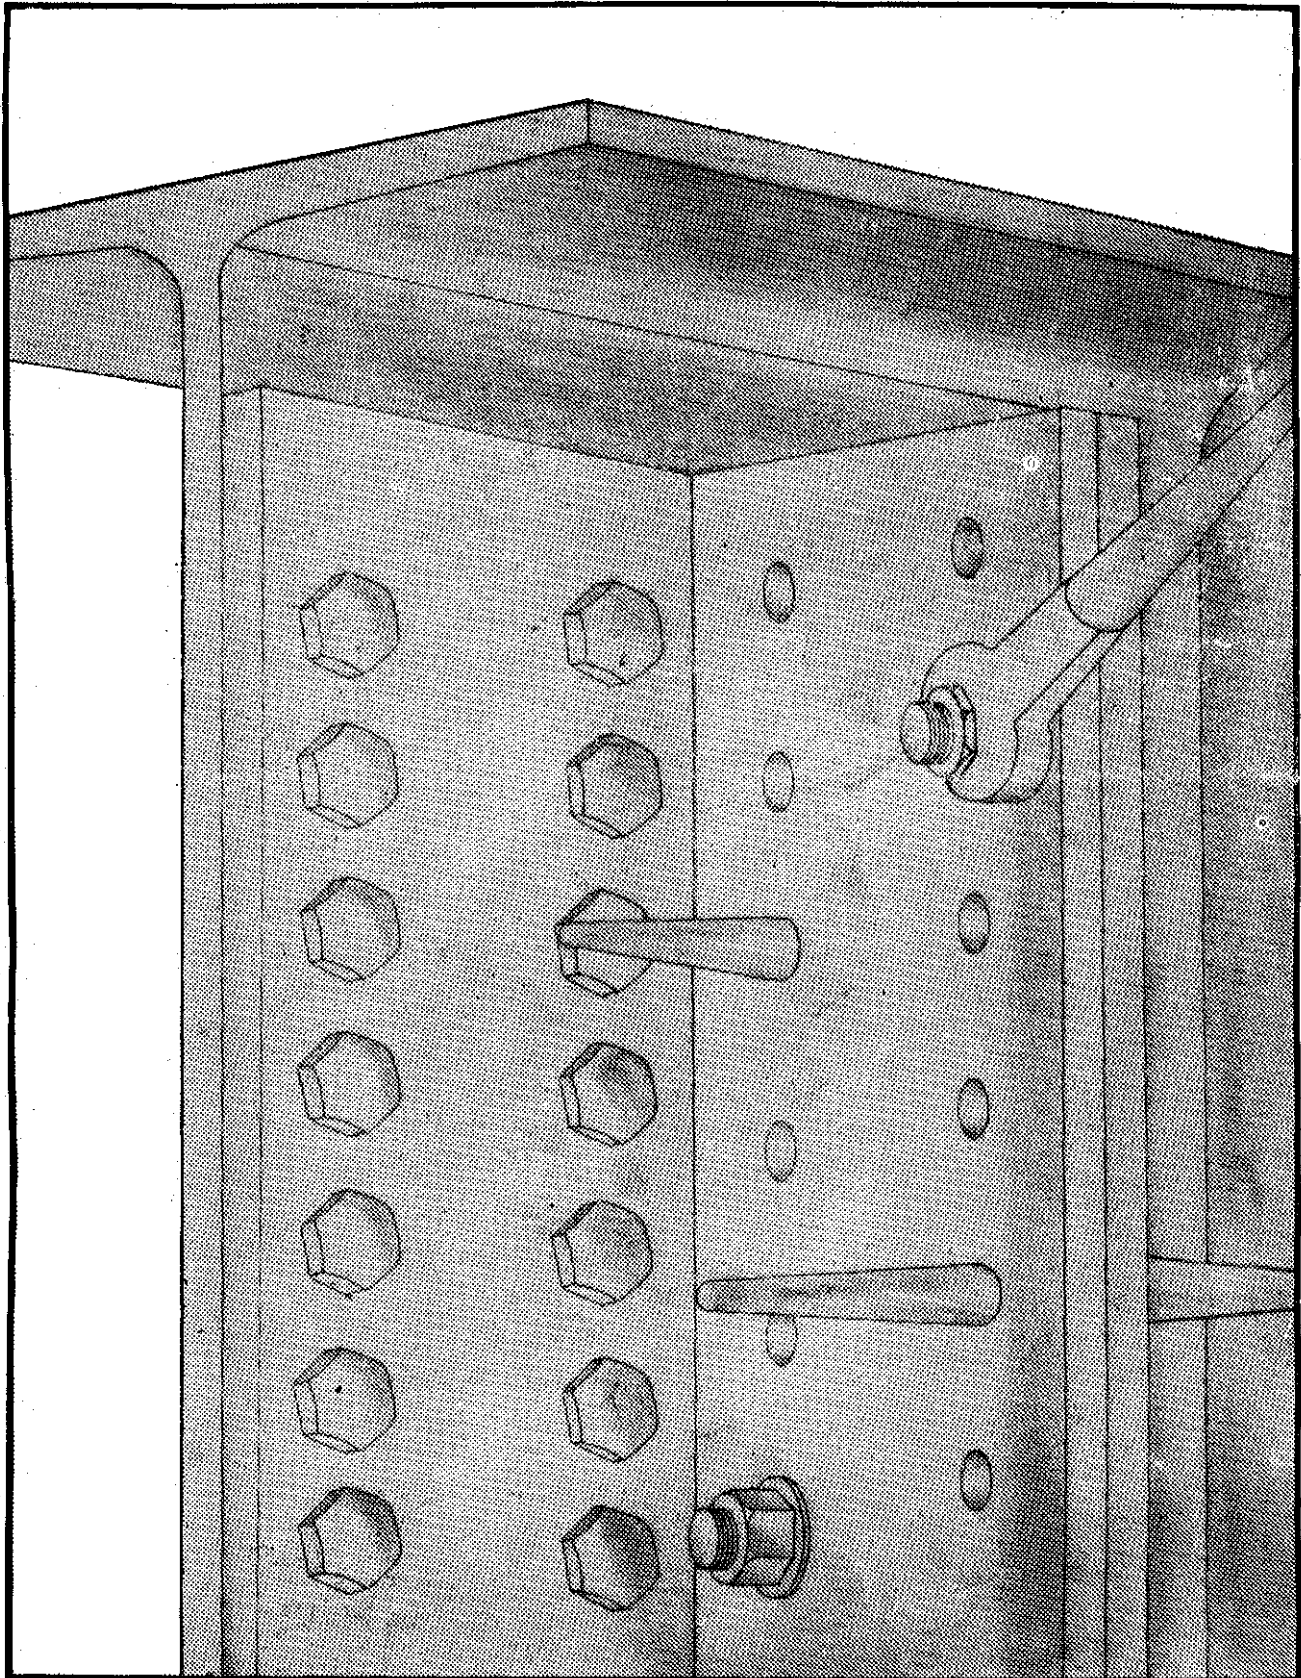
FLAIRING - UP OF HOLES USING DRIFT PINS
